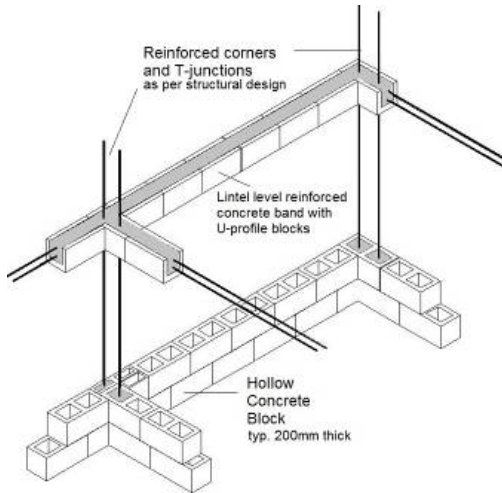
Masonry wall assembly with Hollow Concrete Blocks
